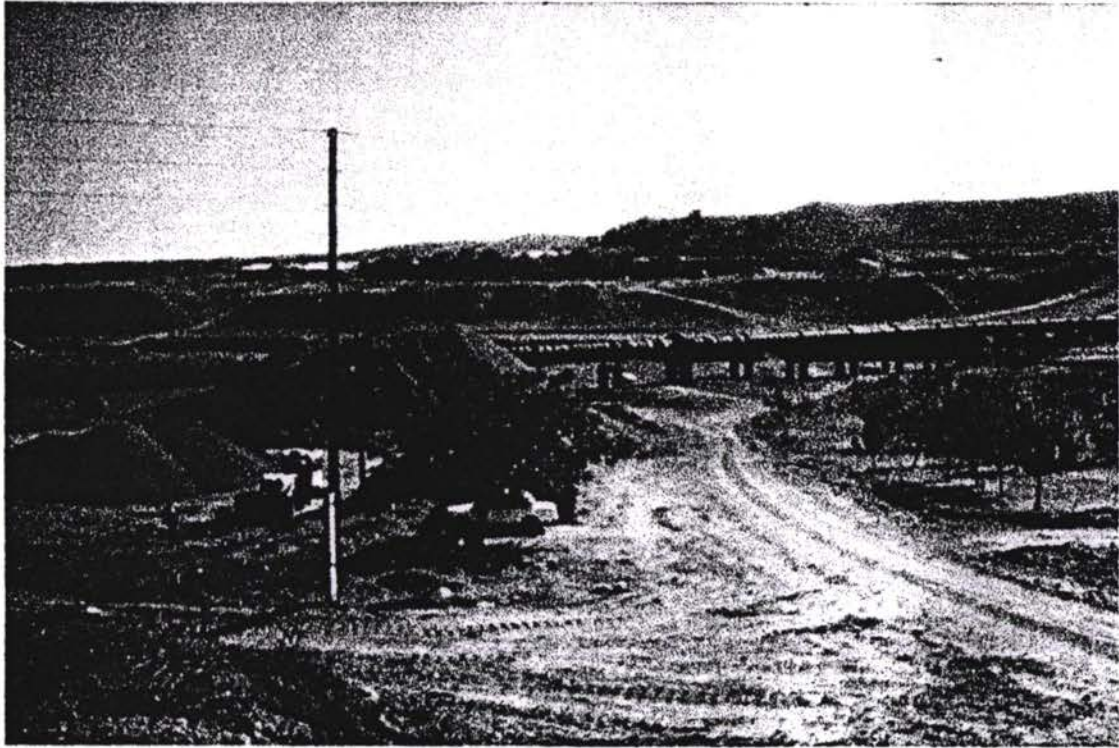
State owned borrow pit within the river Tovuz north of the town Tovuz (Borrow pit no 6)
